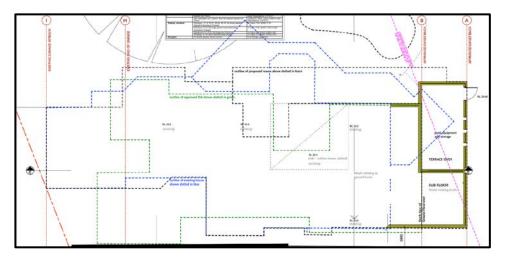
Extract of lower ground floor level, showing the three building envelopes – existing, approved and proposed (s4.55 plan set, dated March 2021)
